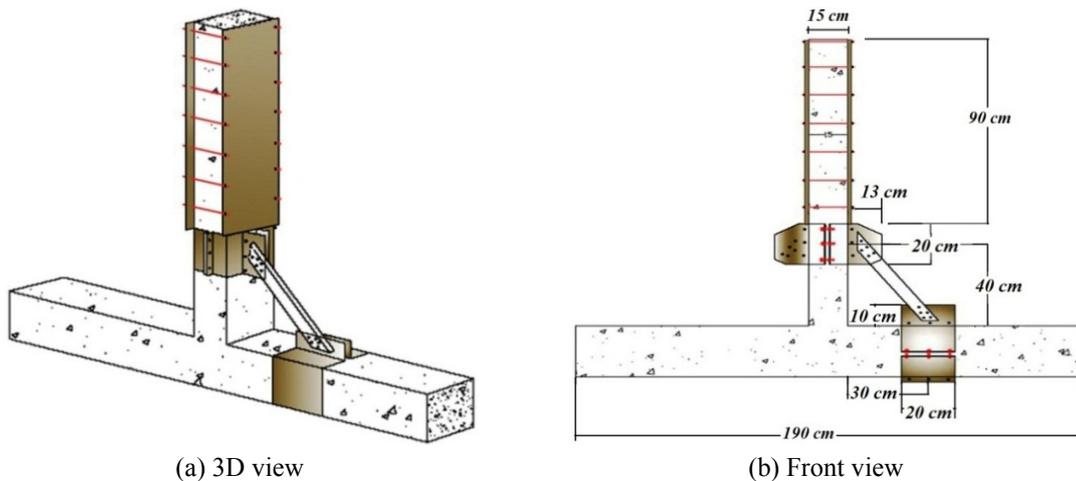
Schematic views of SRCC-2 specimen and its dimensions
